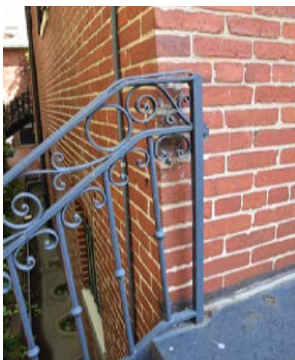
[Lower Left] Split in handrail at southwest porch stair. [BBB, 2024]
